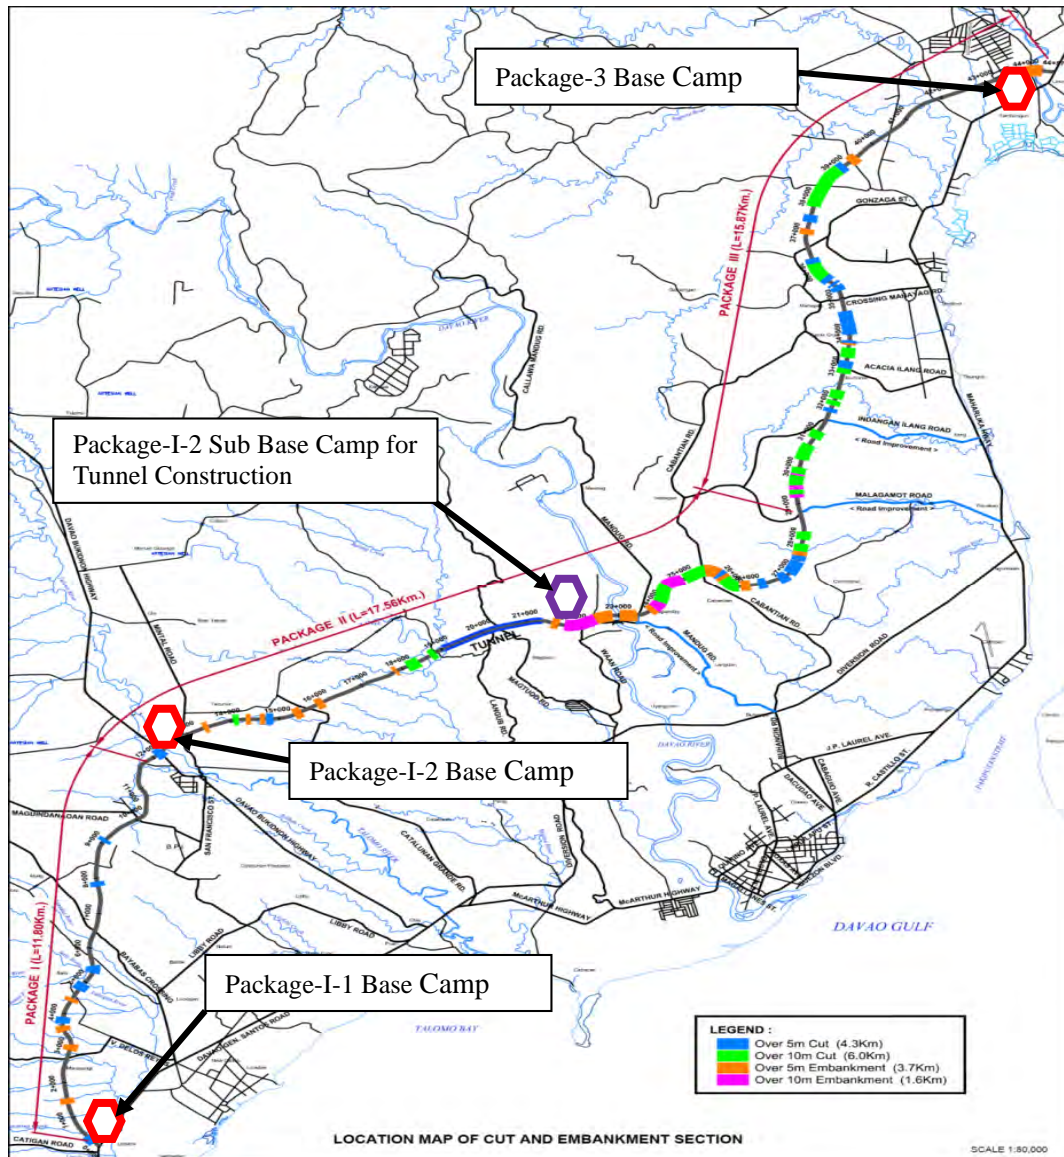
TYPICAL RECOMMENDABLE TEMPORARY YARD FOR CONSTRUCTION
